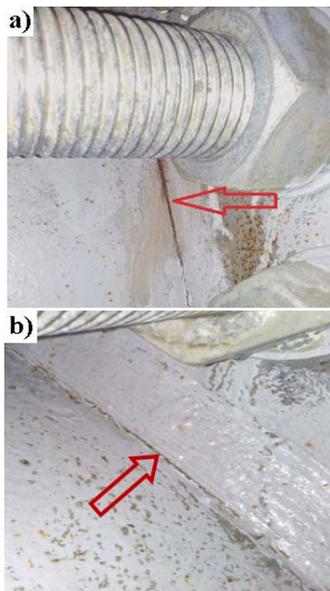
Crack formation in pipe-plate welding zones
